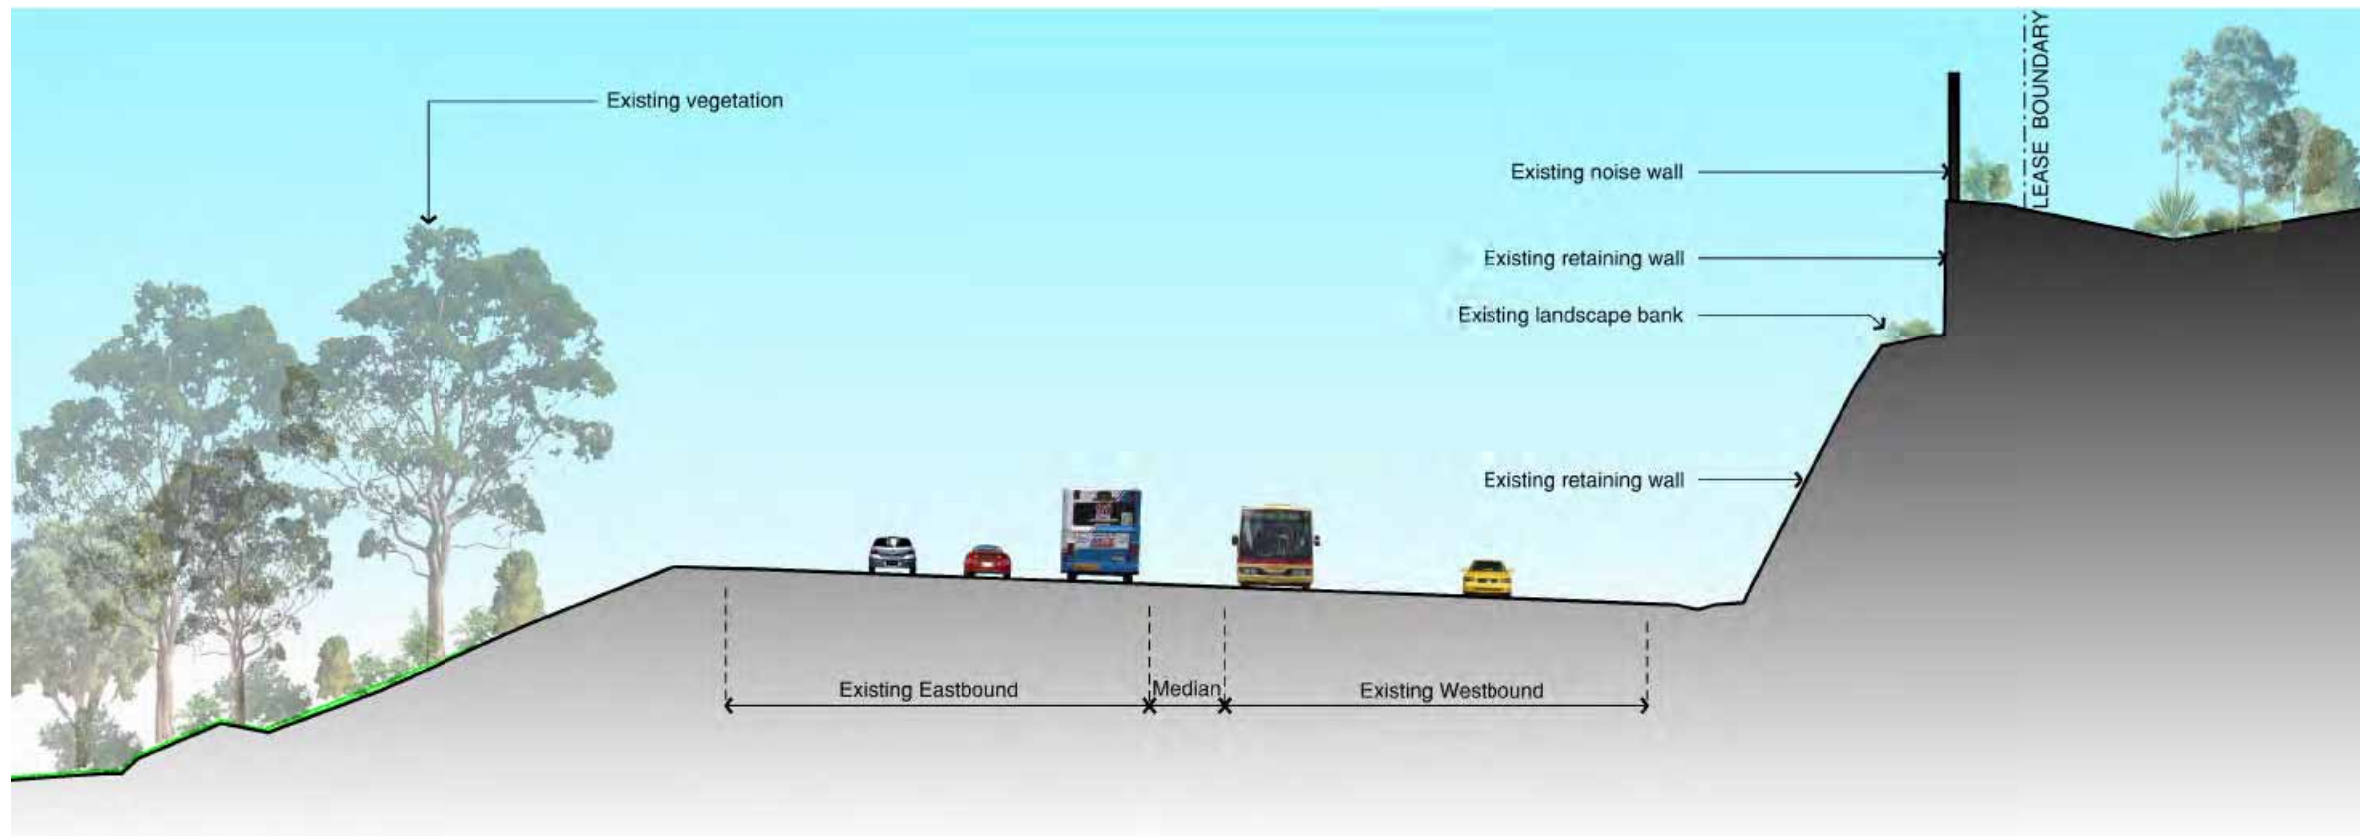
Stn 10350 Large cut with shotcrete - Existing
